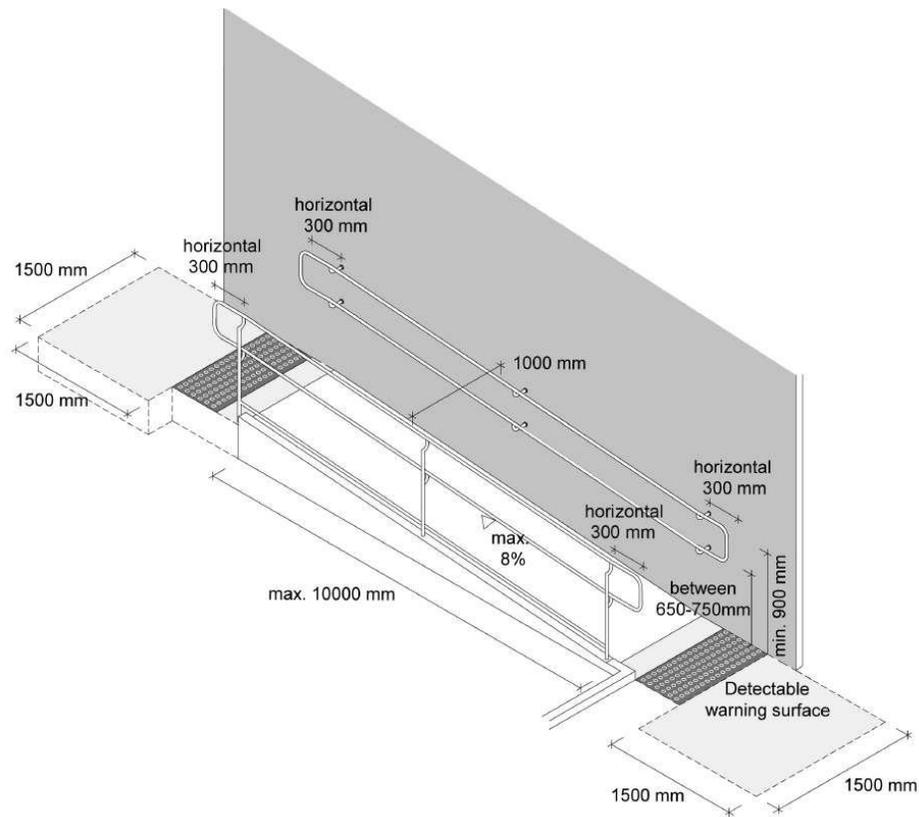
Example of accessible ramp with handrails (MOCD 2019, p. 44)
